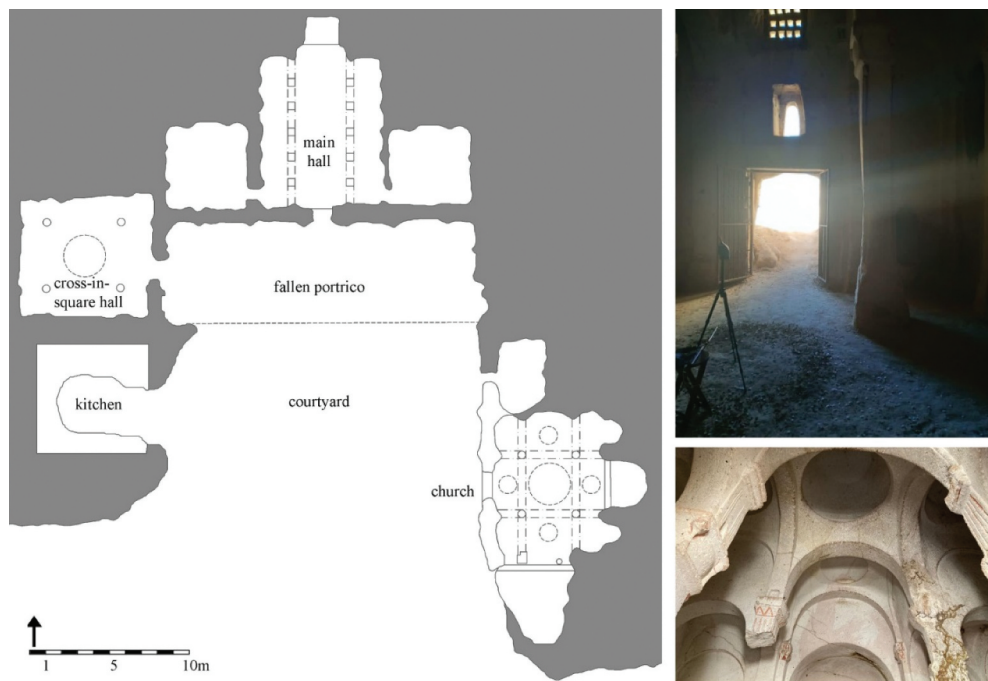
(left) Hallaç complex plan drawn by the authors based on (Ousterhout 2017), p. 281, (top right) an interior view of the Hallaç Church, (bottom right) the ceiling of the Hallaç Church.
